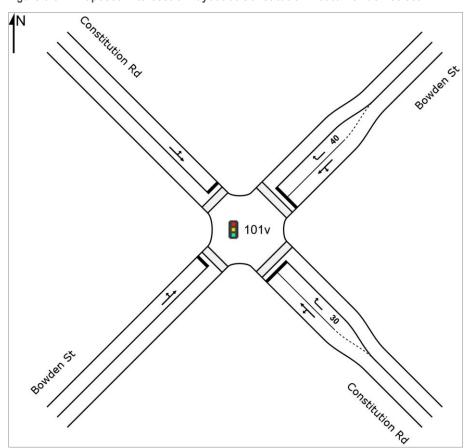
Proposed intersection layout at Constitution Road/ Bowden Street
